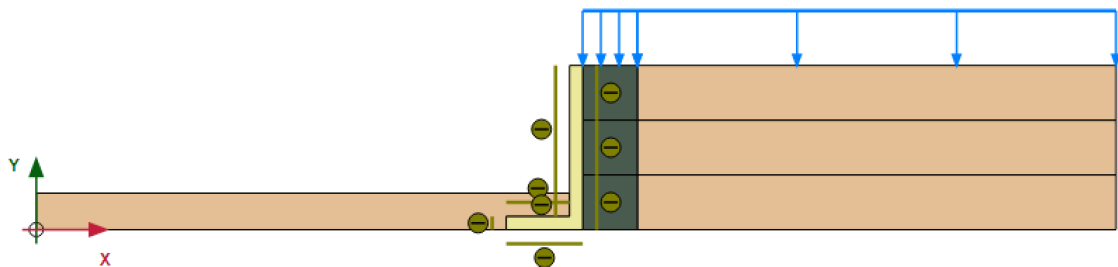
Retaining wall with no backfill slope and 1.5m width TDA backfill
